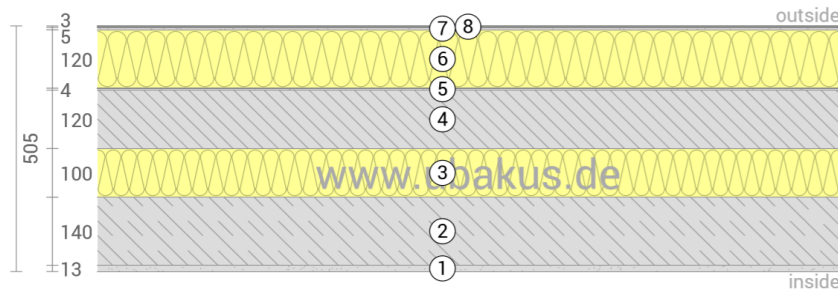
The construction assemblies of the retrofitted reinforced wall of the apartment floor. Gypsum fibreboard (1), reinforced concrete (2), mineral wool (3), brick (4), adhesive (5), fiber-reinforced mortar (6), finishing primer/mortar (7).
